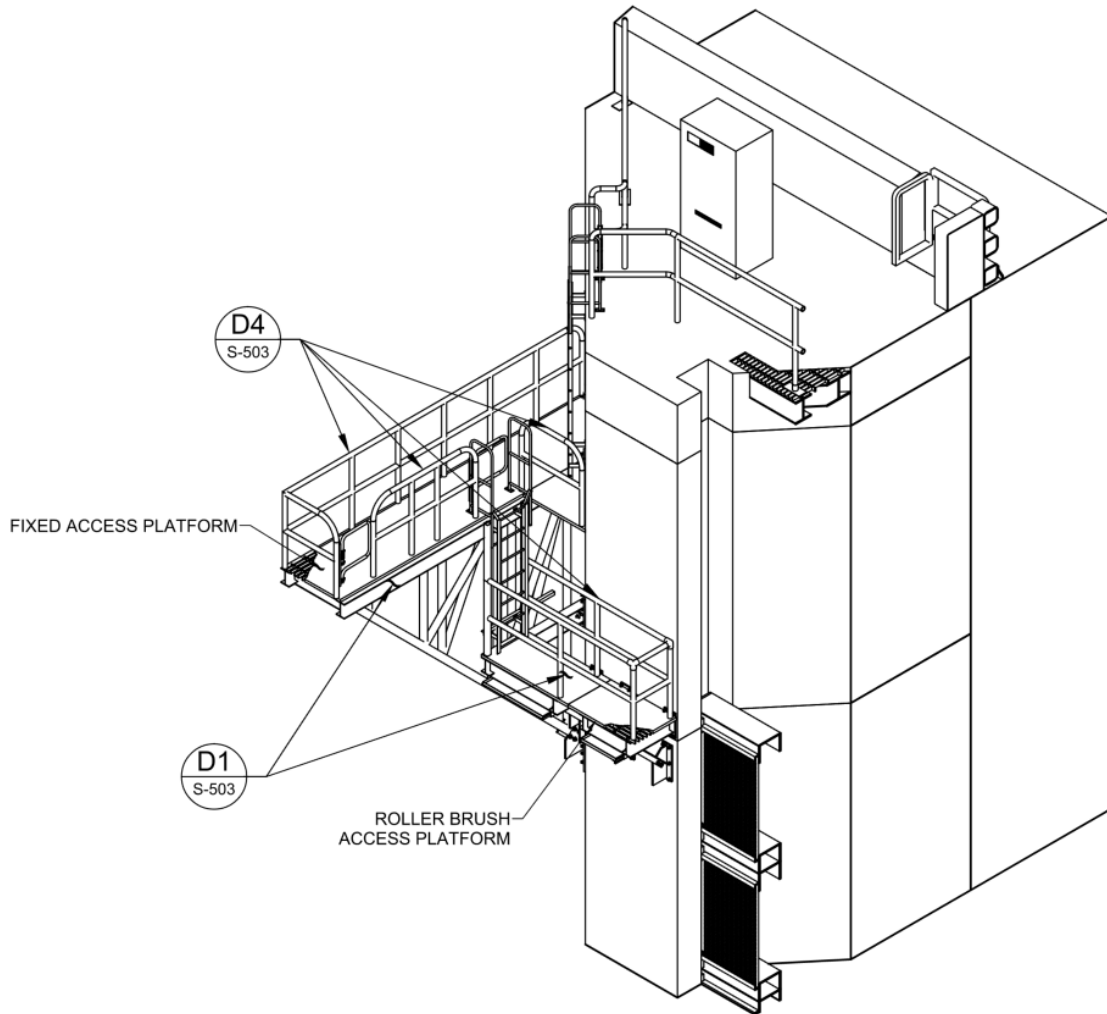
Iso View Fixed Access Platform and Roller Brush Access Platform
